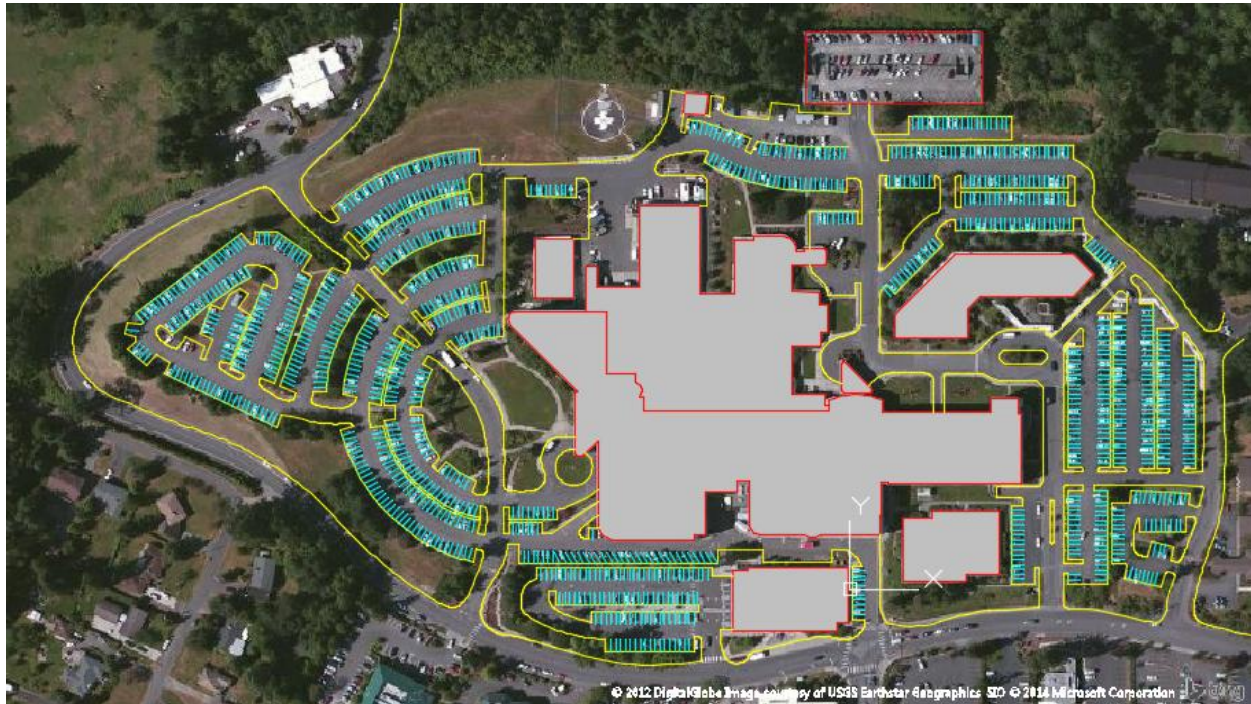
Completed task #3 drawing—a site plan/parking layout for a regional hospital.
